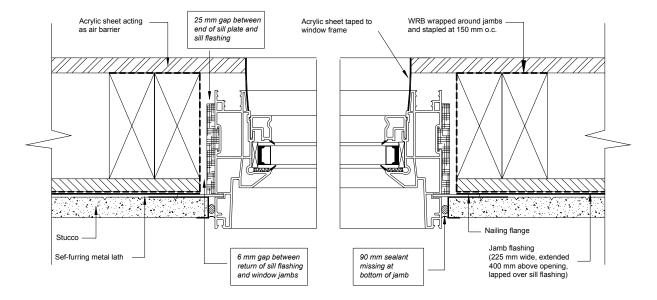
Wall/window interface for specimens No. 1 and No. 3 - Horizontal section
